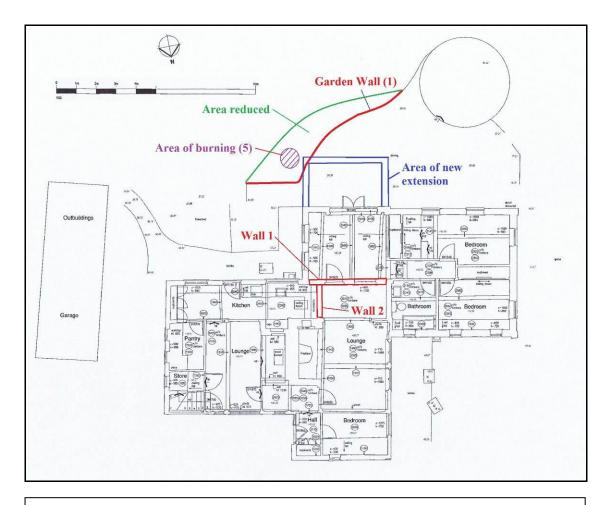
Parrock Brook, Hartfield: Site Plan showing area monitored and mentioned in Section 4
